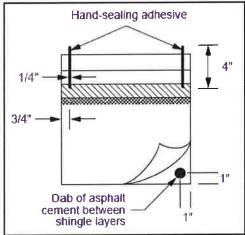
Use six nails and four spots of asphalt roofing cement on steep slopes.
